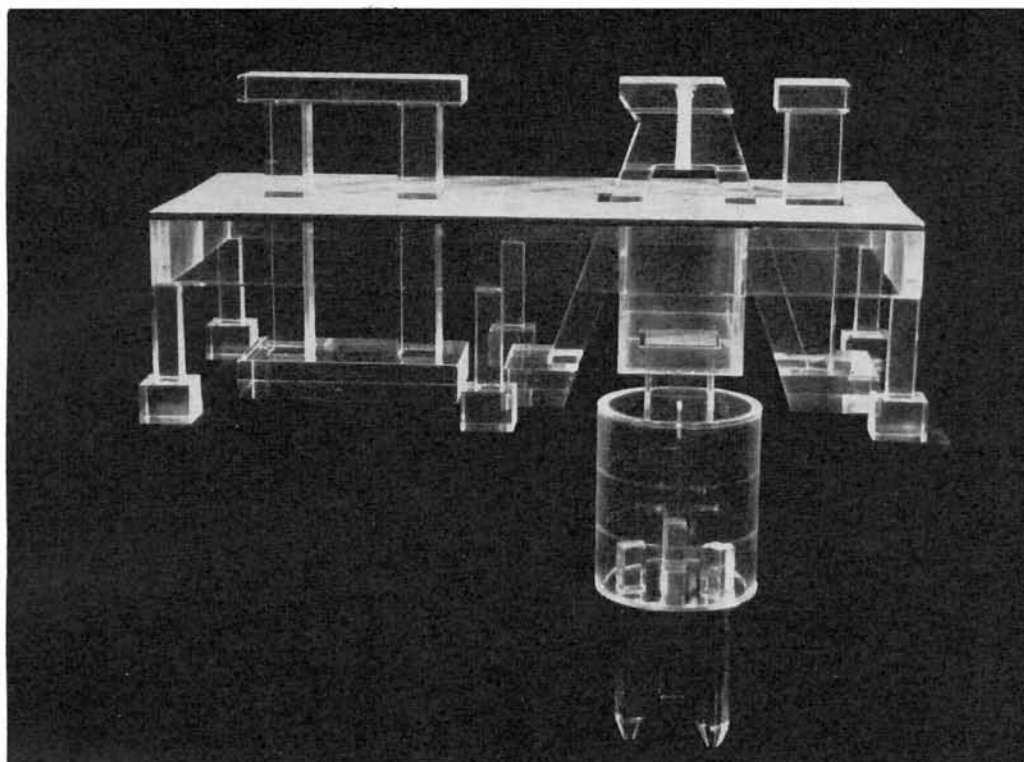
Photograph of a plexiglass model of the 0-1 m- and telescope pillar.
